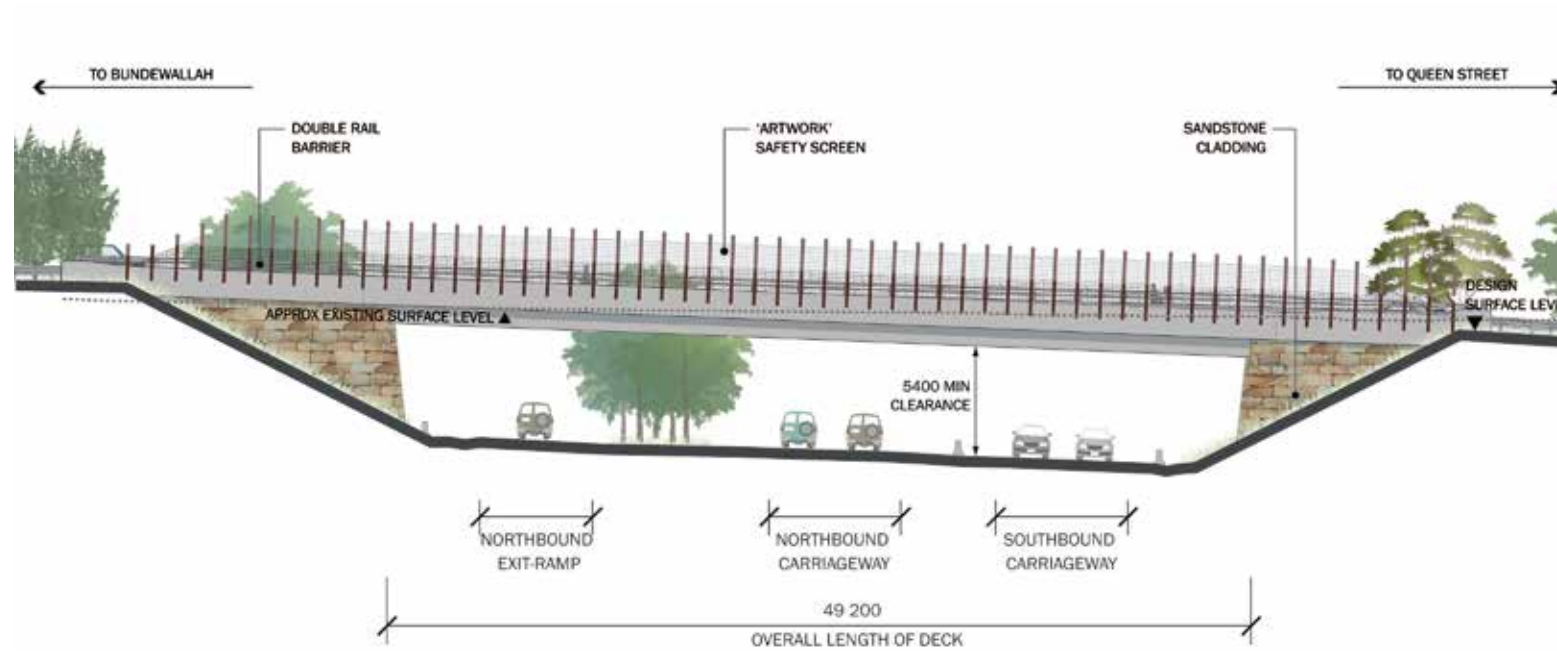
Elevation – Bridge SB08: Kangaroo Valley Road Overbridge (Scale: 1:400@A3)
